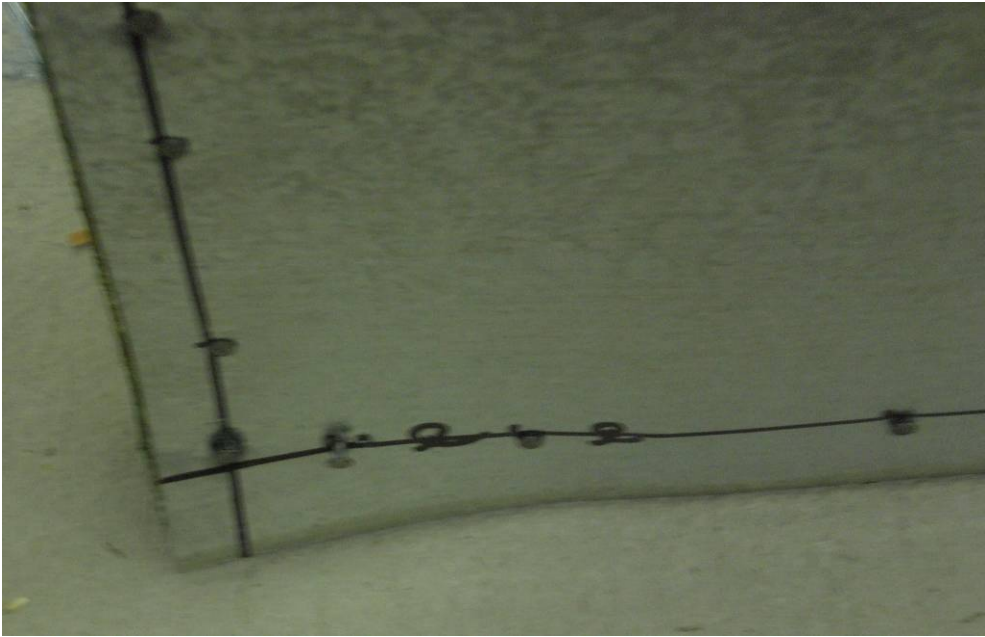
and 3.3b Layout of sheet metal and fasteners for the (a) continuously embedded sill plates and the (b) gusset plates
